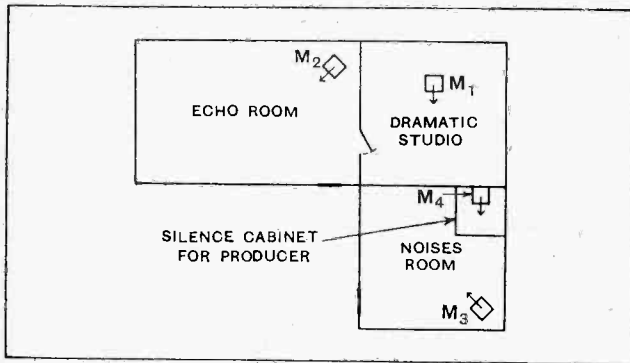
Plan of dramatic studio and adjoining echo and noise rooms.
